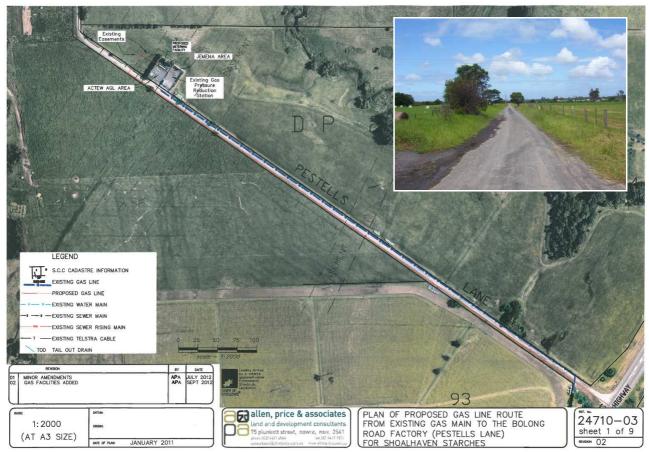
Sheet 1 of the proposed pipeline route (Pestells Lane)
